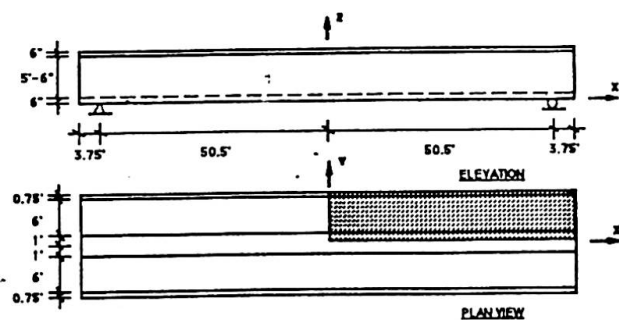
Reinforced and Prestressed Concrete Folded Plate Model (1 in = 25.4 mm)
